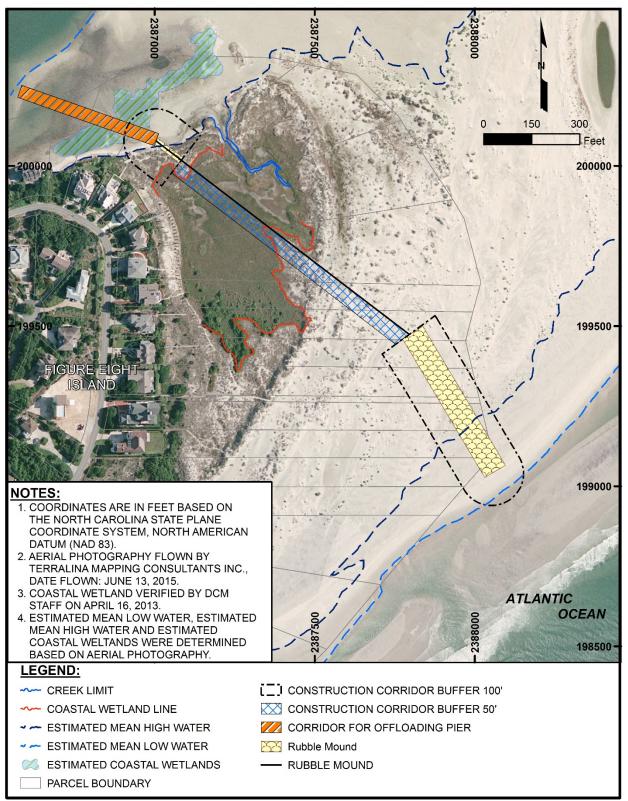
Footprint of the terminal groin, construction corridor, and offloading pier for Alternative 5D.
